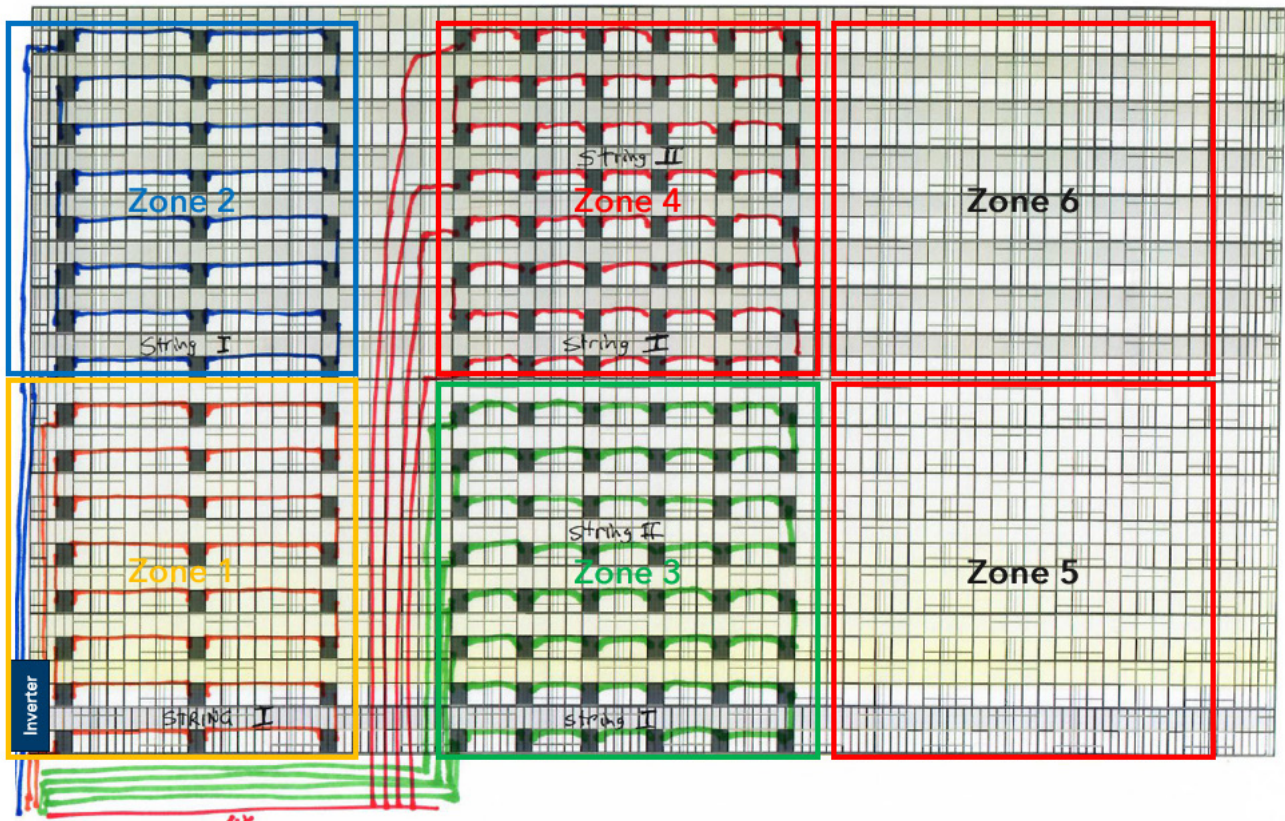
Detailed string arrangement for the PV arrays on the greenhouse
